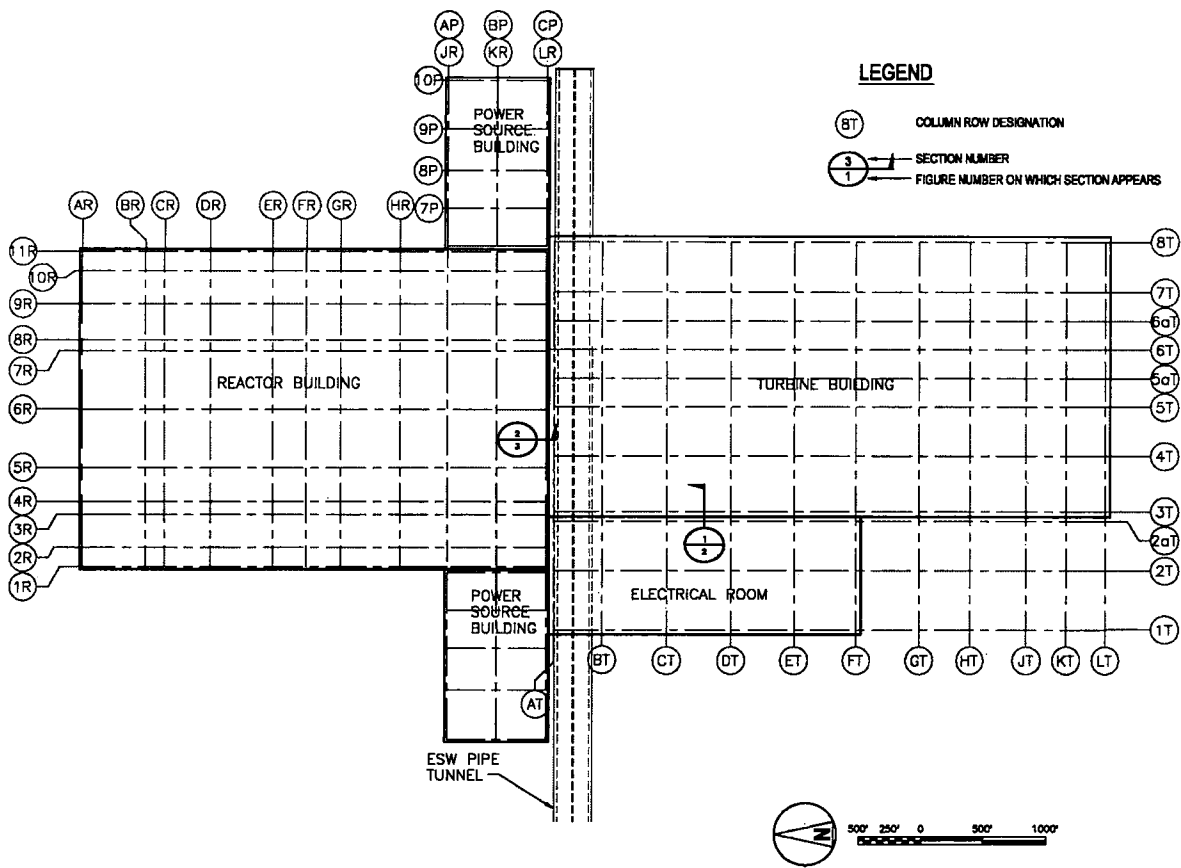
Plan Arrangement of Turbine Island and Adjacent Reactor Building and Power Source Buildings
